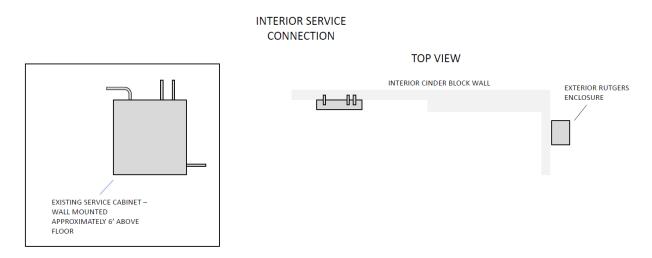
Interior Service Connection at Route 18 - Boyd Park "Boathouse"
